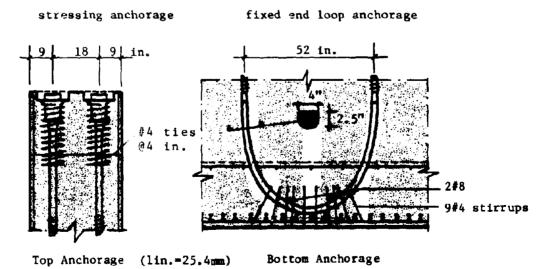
Post-tensioning System and Achorage Details for Reaction Wall
